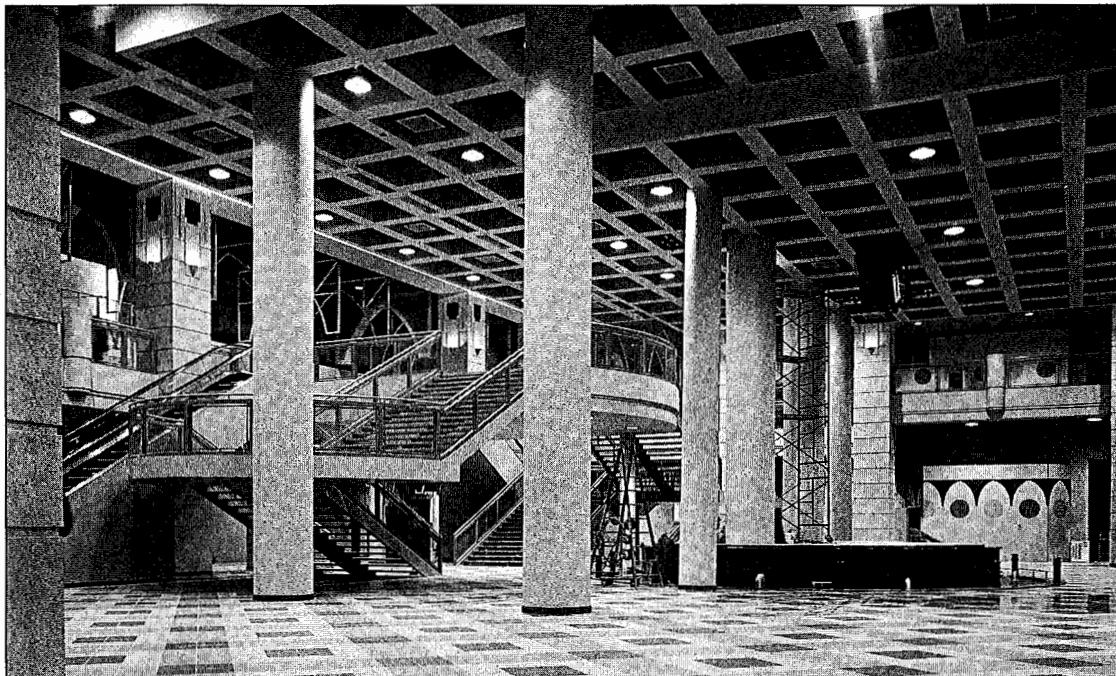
A view of the interior of the new shopping complex and the open grid ceiling below the new concrete shelf.
